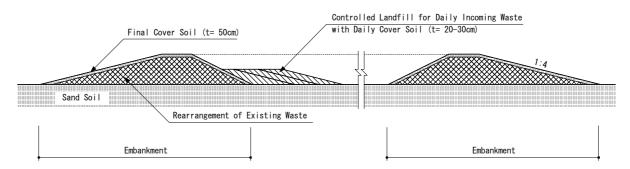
Typical Cross Section of Landfill Site in Zone I & II
